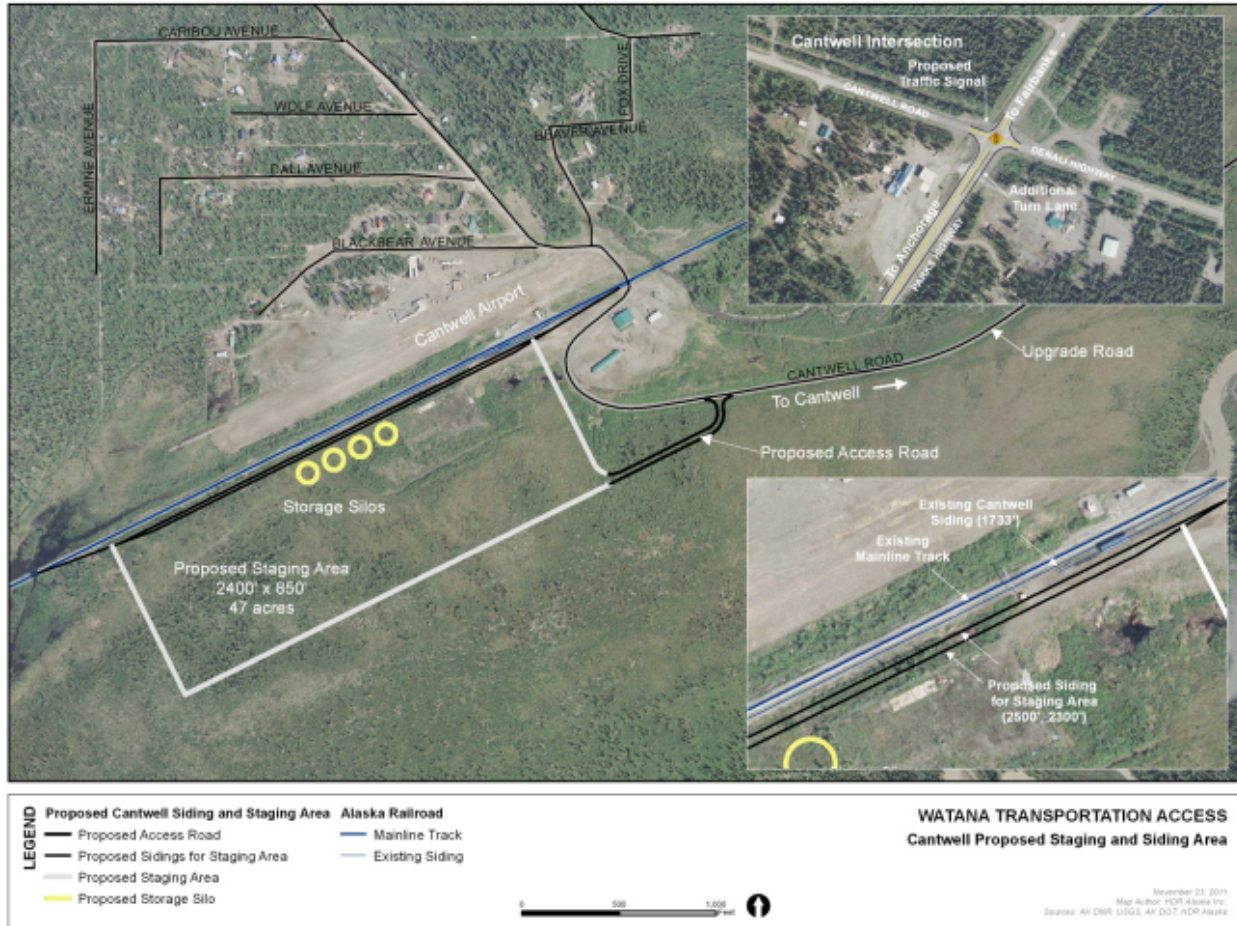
Conceptual Cantwell railroad staging and siding area
